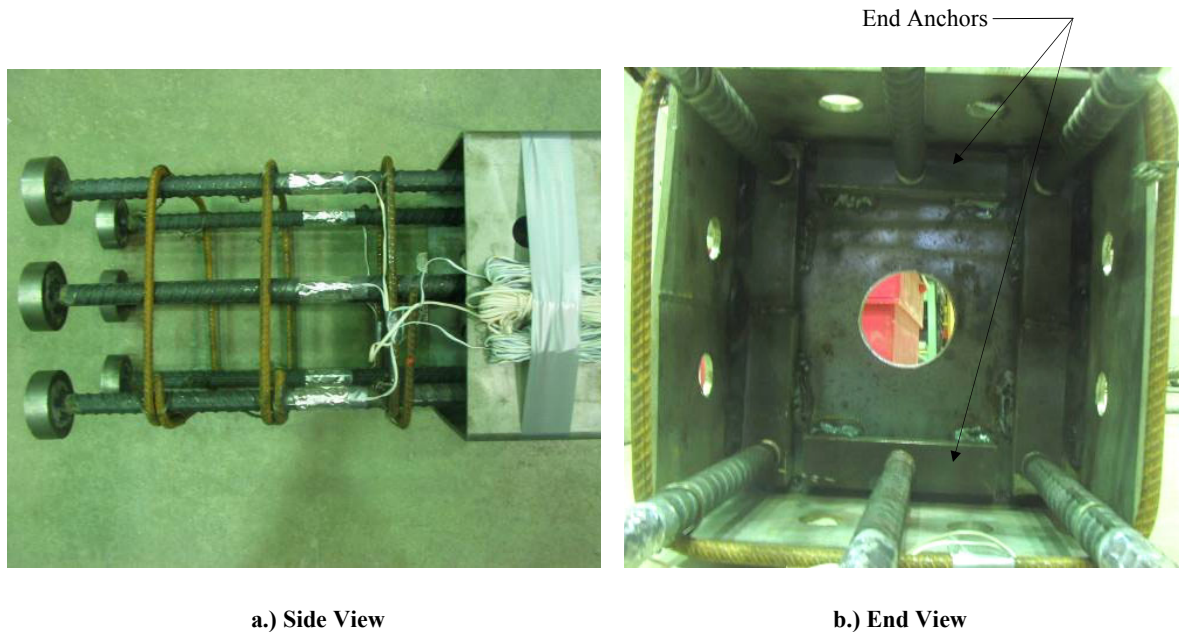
Column 5 mild steel reinforcement in the 2 ft. segment.
